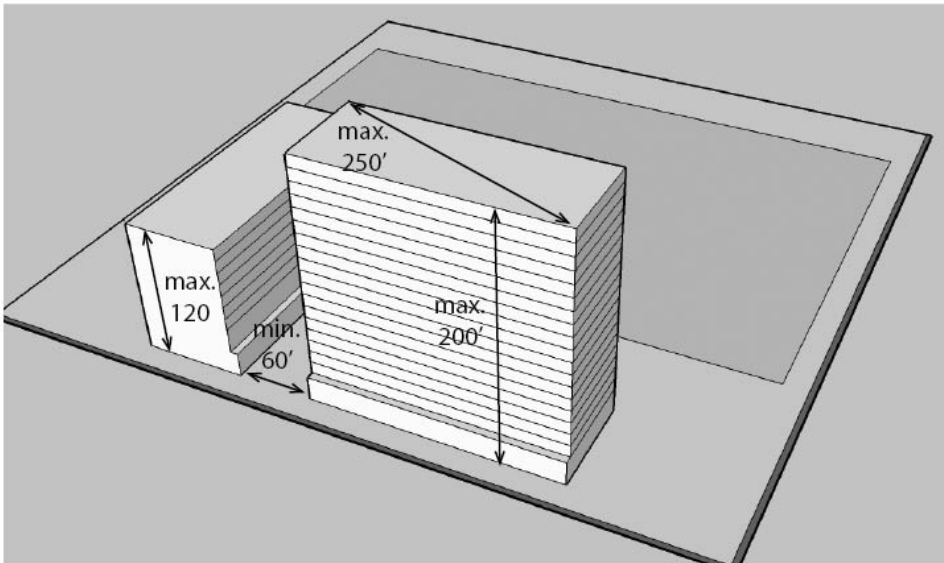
Height, Bulk and Spacing for Buildings 120’ to 200’ High near a Building 65’ to 120’ High
